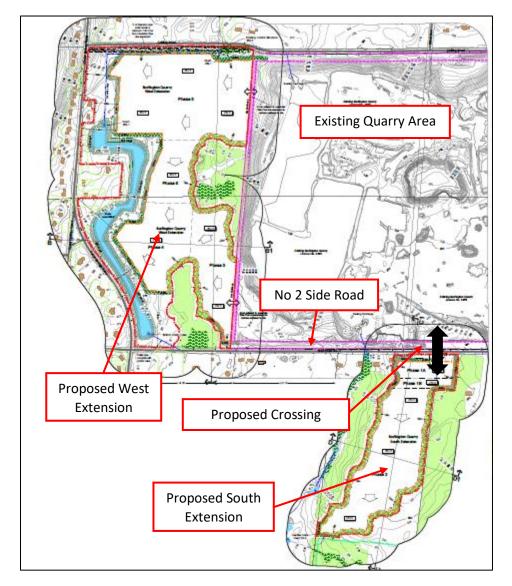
Site plan showing the existing quarry and proposed extensions and crossing (MHBC)².
